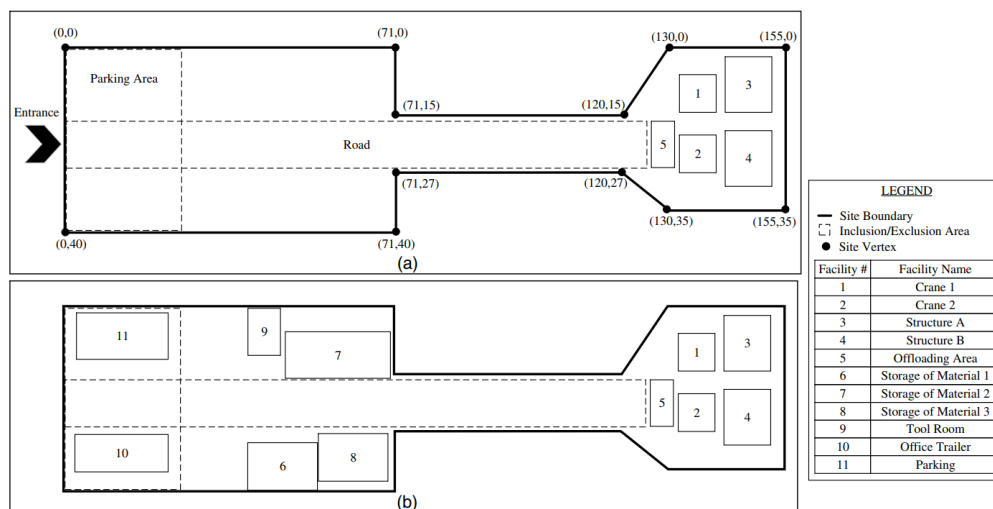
(a) Overview of the site layout; (b) Optimum site layout (RazaviAlavi, 2017).
